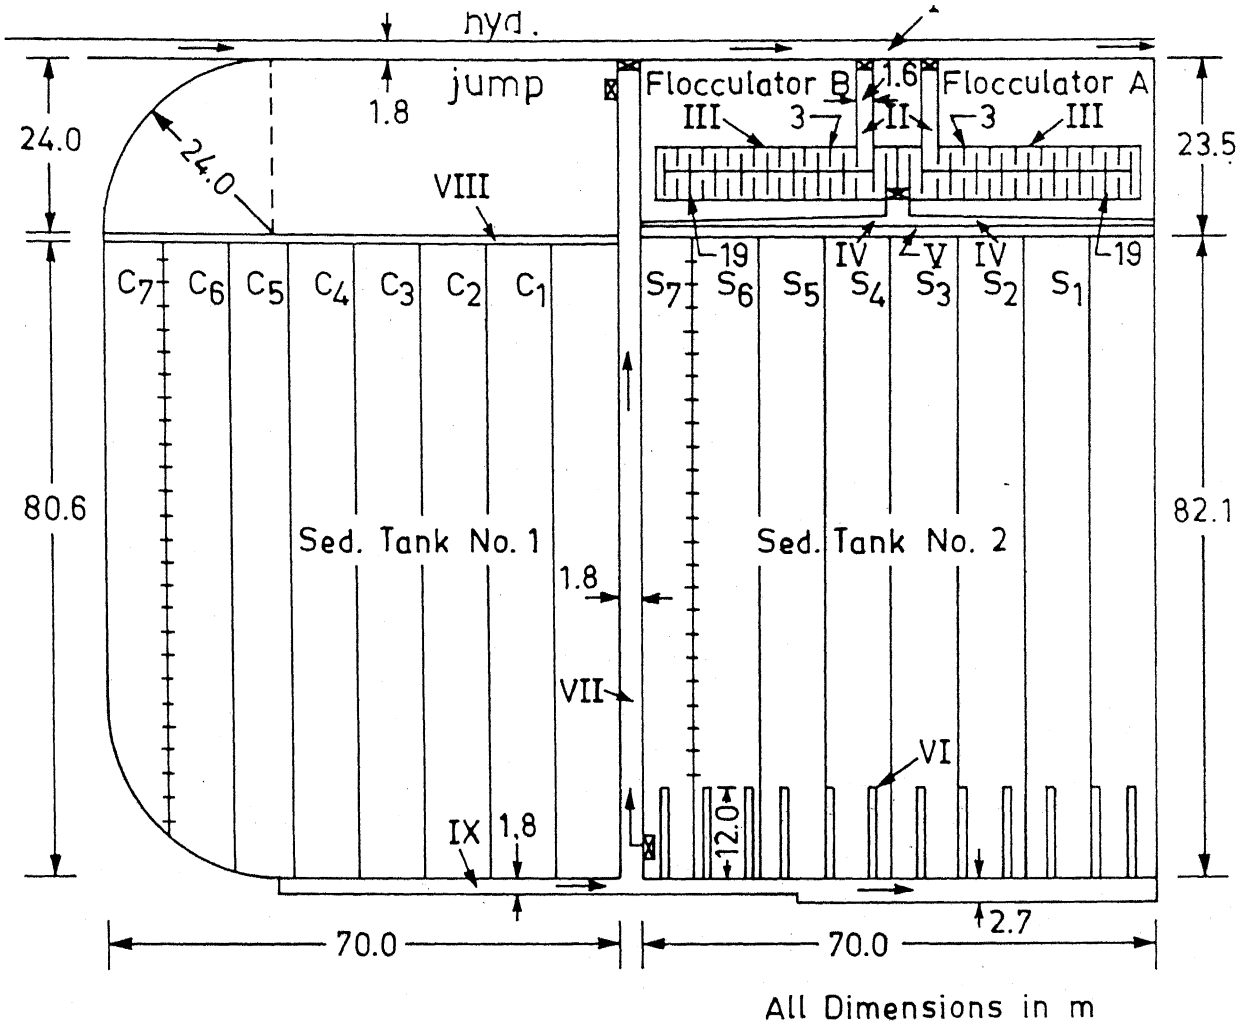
Layout Showing Flocculators and Sed. Basins with Cables.
